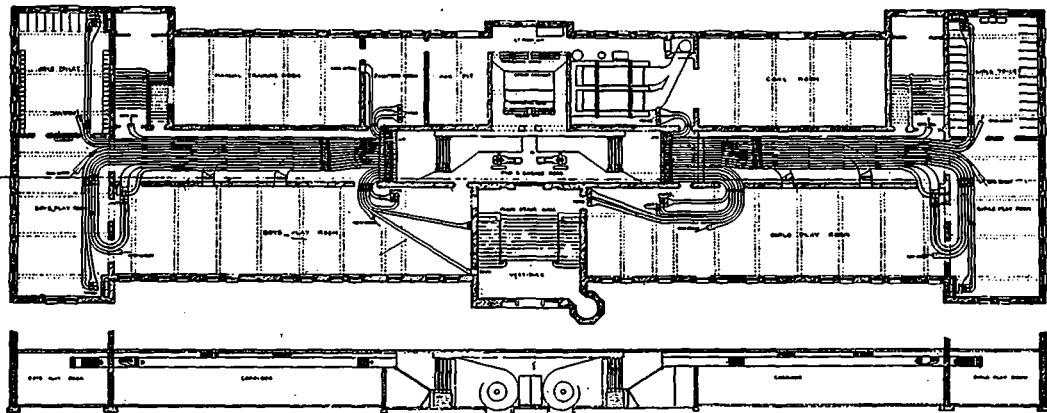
WILLIAM CLARK SCHOOL, ST. LOUIS, MO. BASEMENT HEATING PLAN, WITH VERTICAL SECTION AT A-B. WILLIAM B. ITTNER, ARCHITECT, AND CLAUDE A. BULKELEY, CHIEF ENGINEER.
